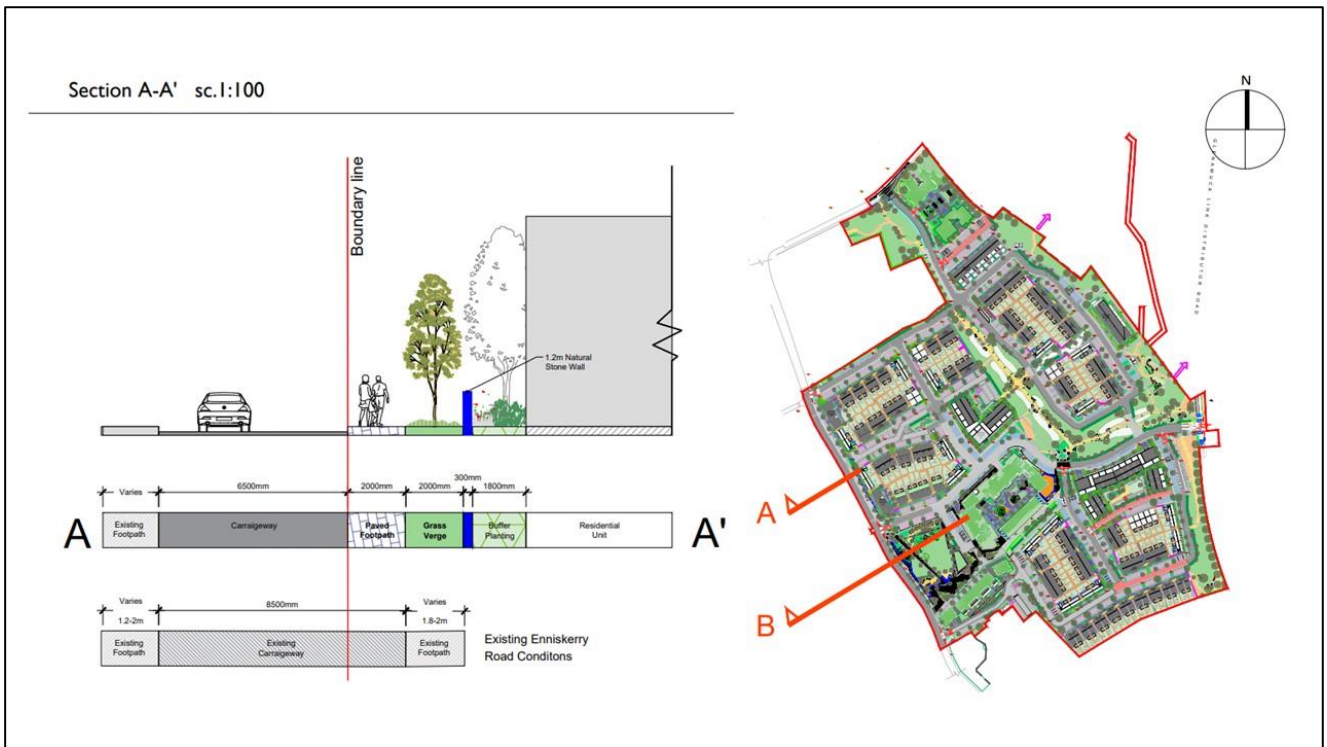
Proposed Enniskerry Road Treatment – extract from RMDA landscape Drawings
